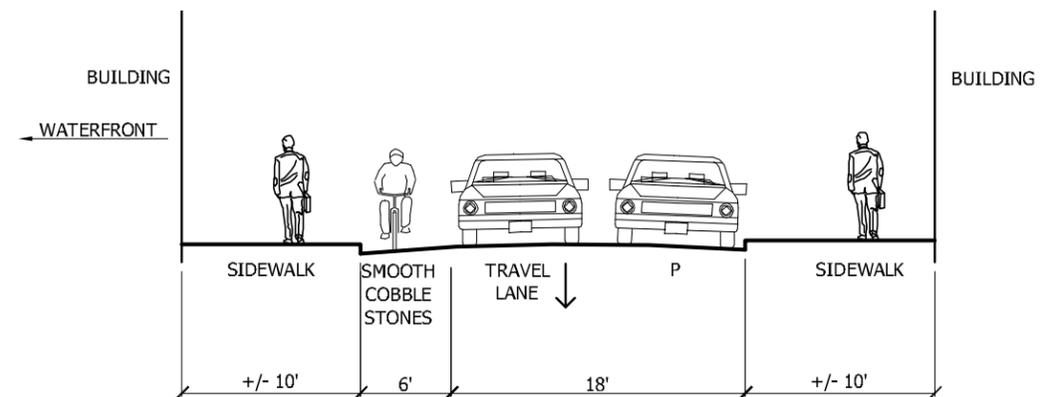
Possible configuration for Water Street looking west from Jay Street
